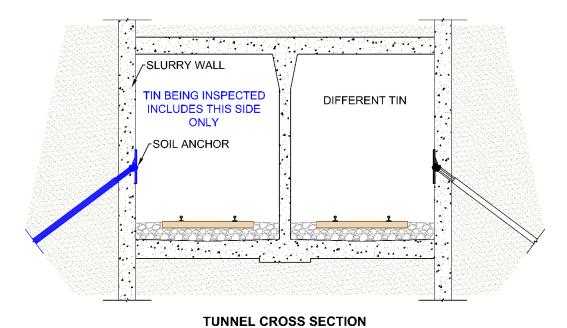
Element Qty Boundary: Soil Anchor (EA)
